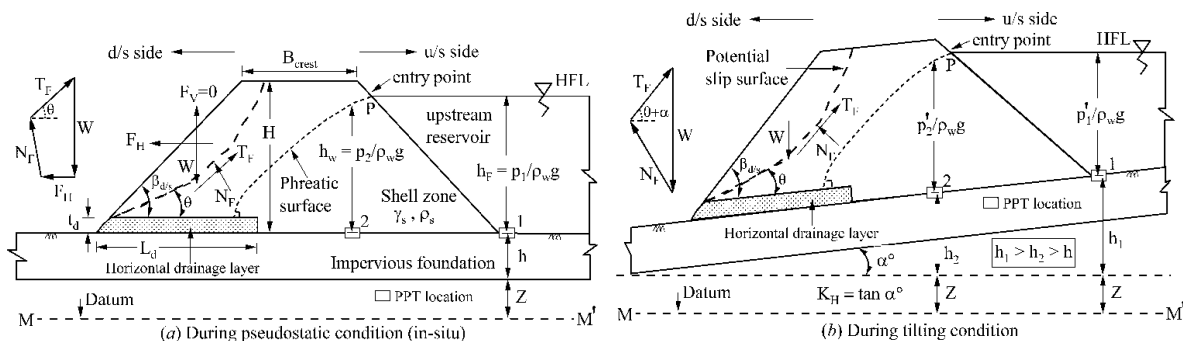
Earthen dam section under inertial loading (after Kumar and Viswanadham, 2022)
